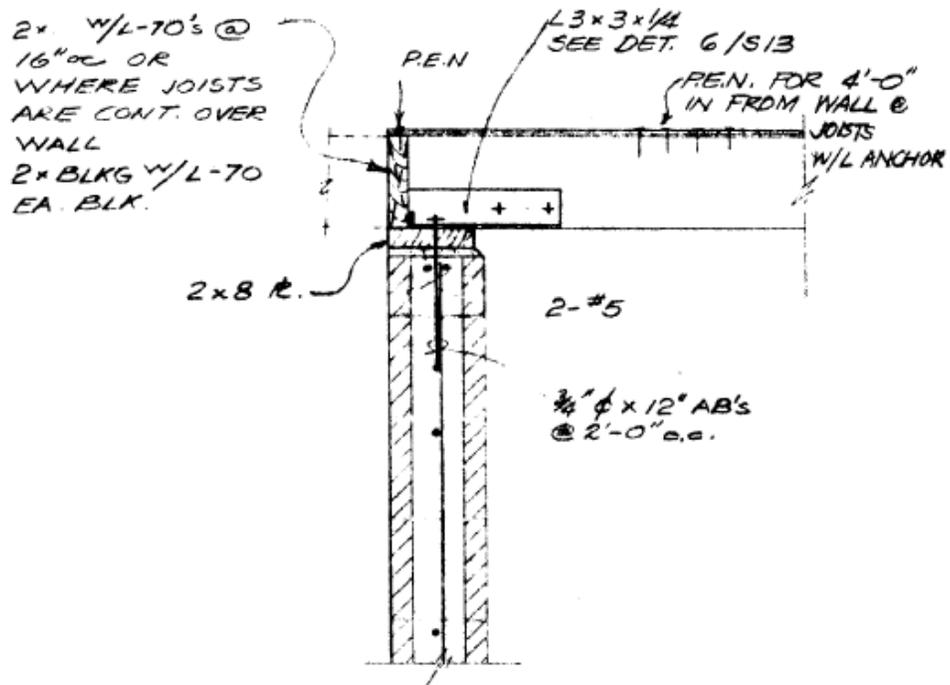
An example of one of the wall-roof connections used in Buildings A and C. Because the anchor bolts in the masonry lack sufficient side cover, this connection is overstressed with a D/C of 1.53.
